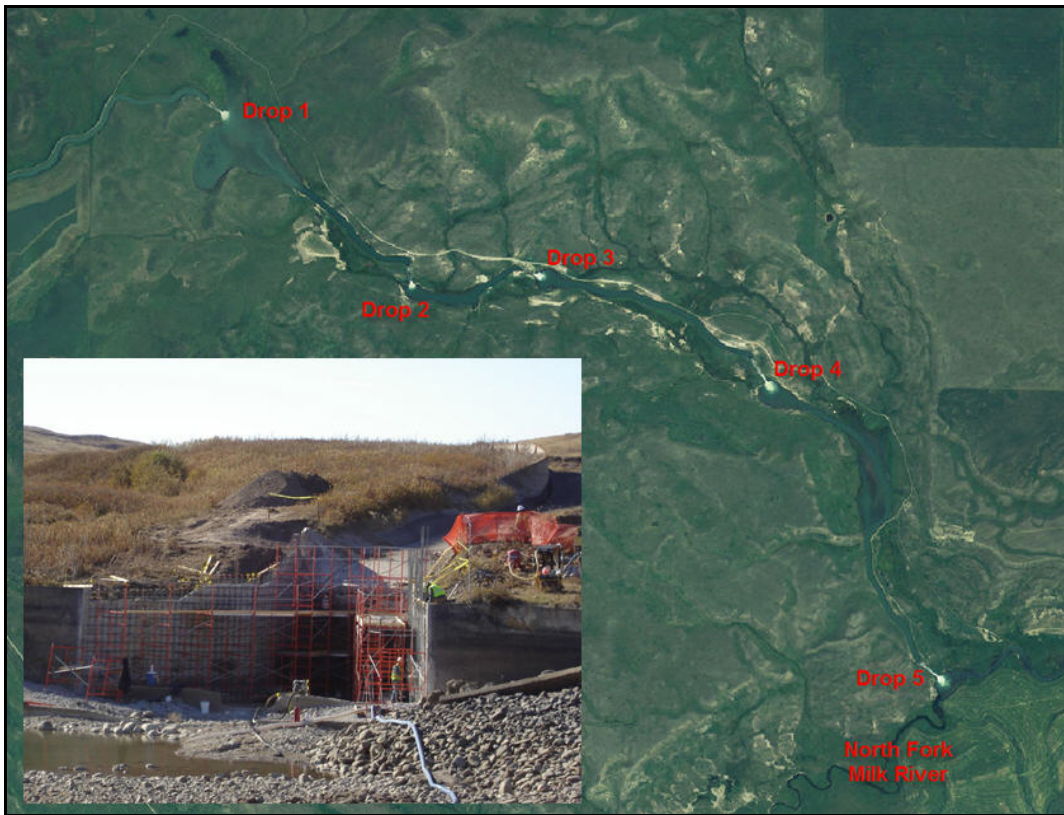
U.S. St. Mary Canal Drop Structures. Photo: John Sanders
